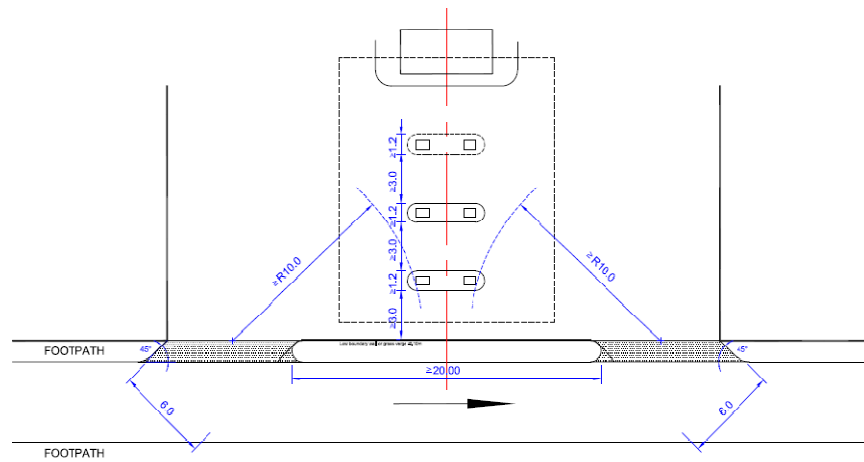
Access Layout for Fuels Stations on One-way Streets and Dual Carriageways
